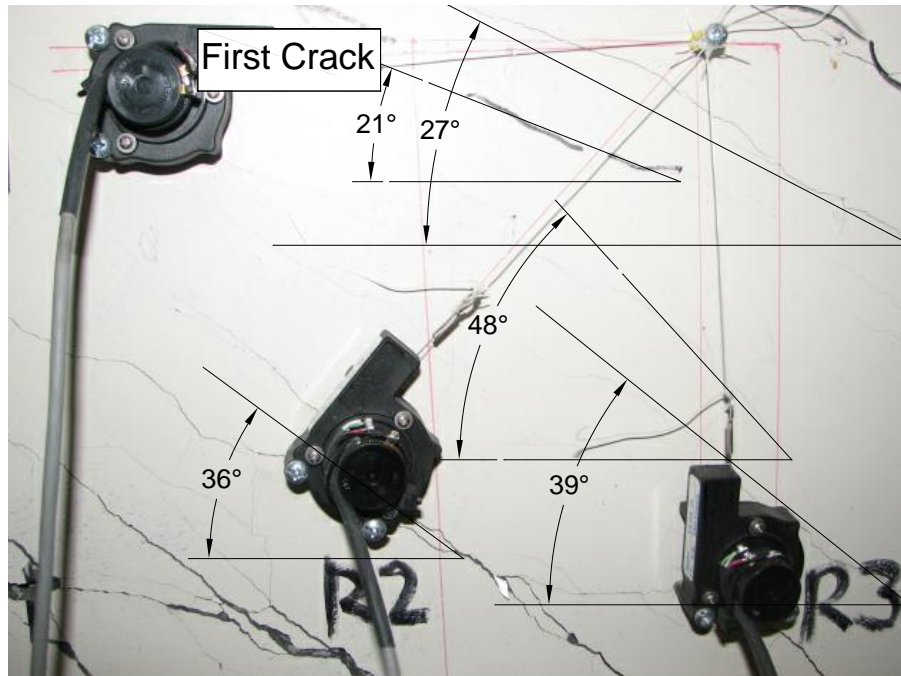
BDT Girder 1, shear test, cracks through rosette
